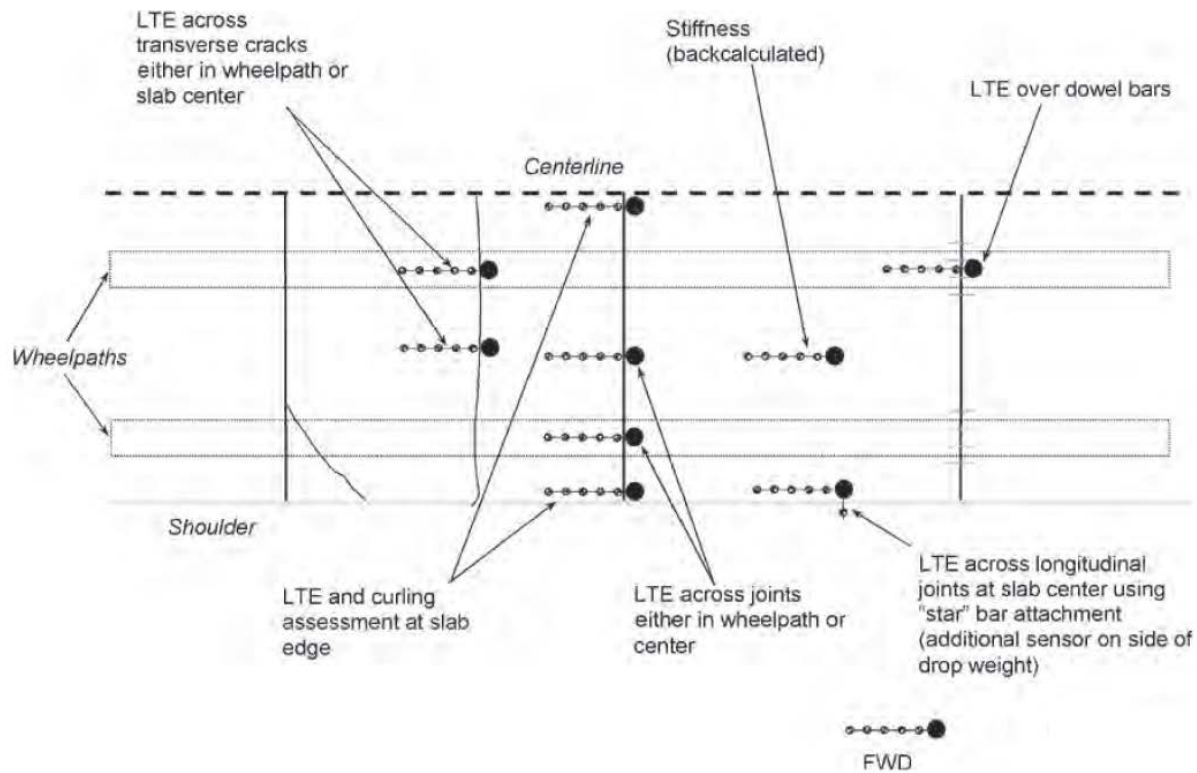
(a). Example FWD Test Locations on Jointed Plain Concrete Pavements.
